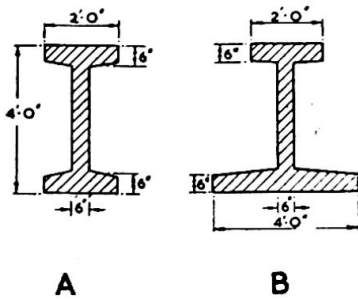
Girders of types A (partially prestressed) and B (fully prestressed).
